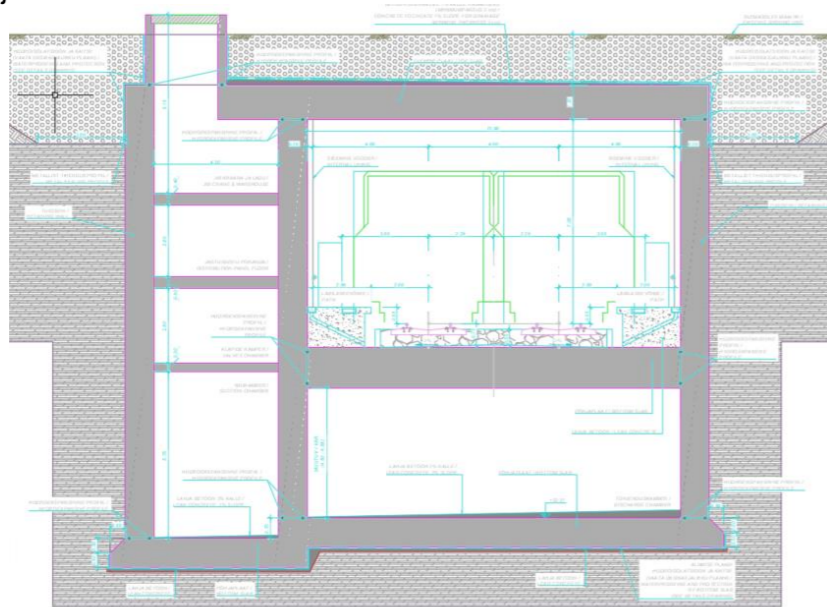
Typical section of BR0060 tunnel showing drainage elements
